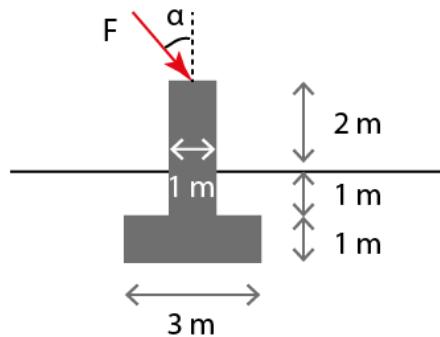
Shallow foundation subjected to vertical and horizontal forces
